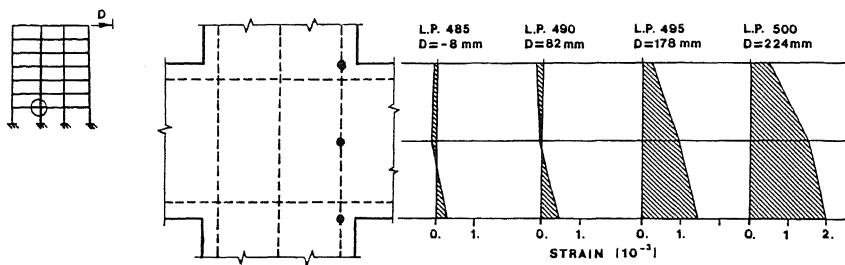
Distribution of Strain Along Column Longitudinal Bar.
